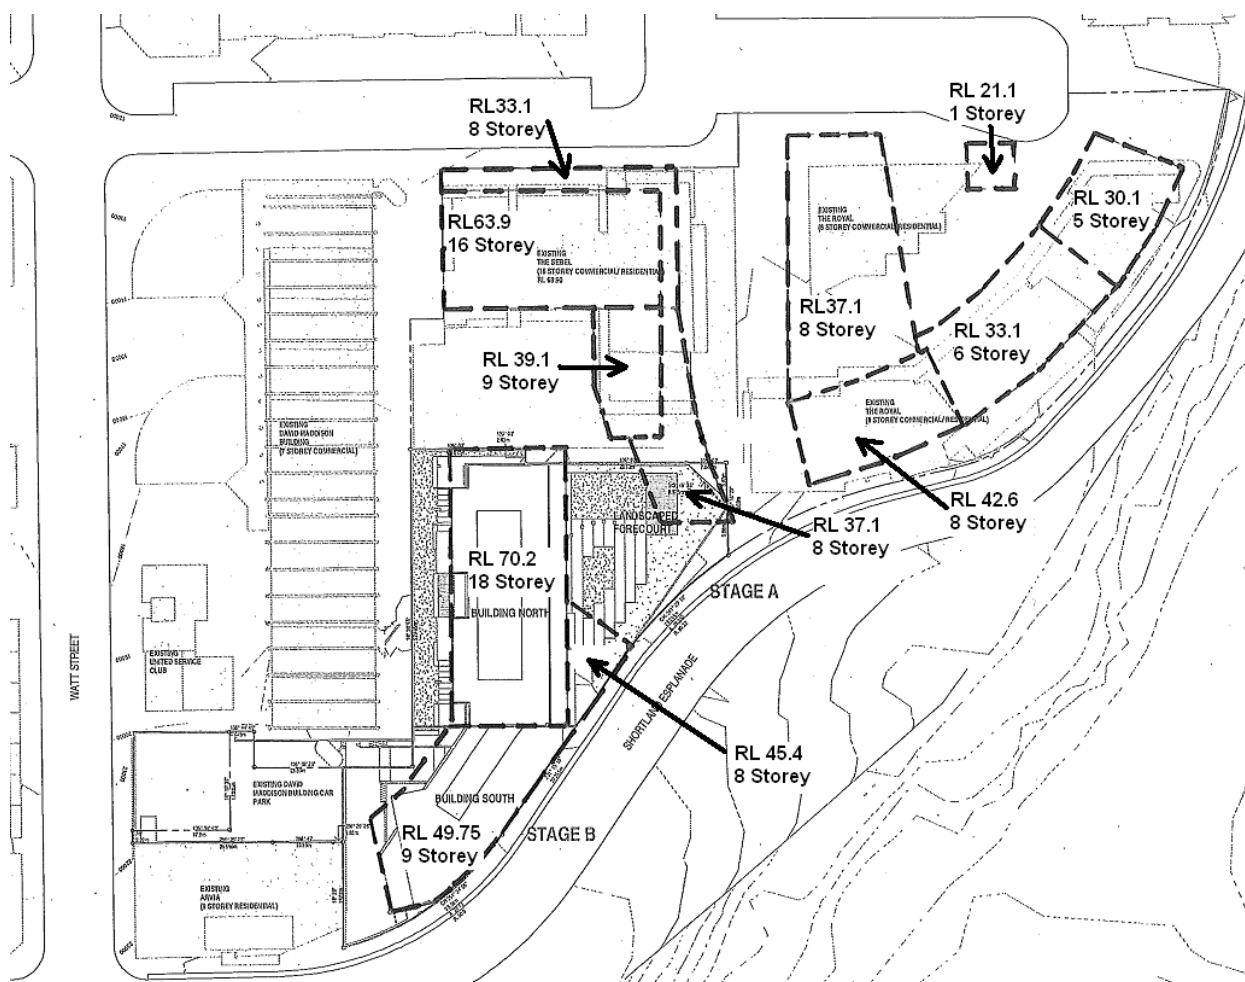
Proposed Site Plan with Concept Plan MP05_0062 building envelopes overlain.
